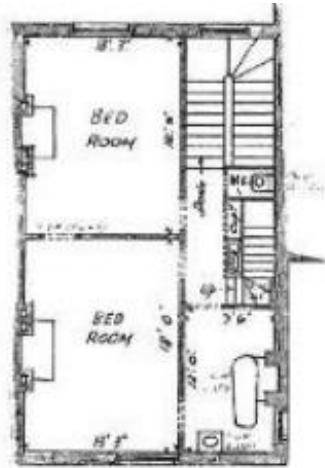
Plan of the Second Floor of 15 Cumberland Terrace in 1919 (Camden Archives).
